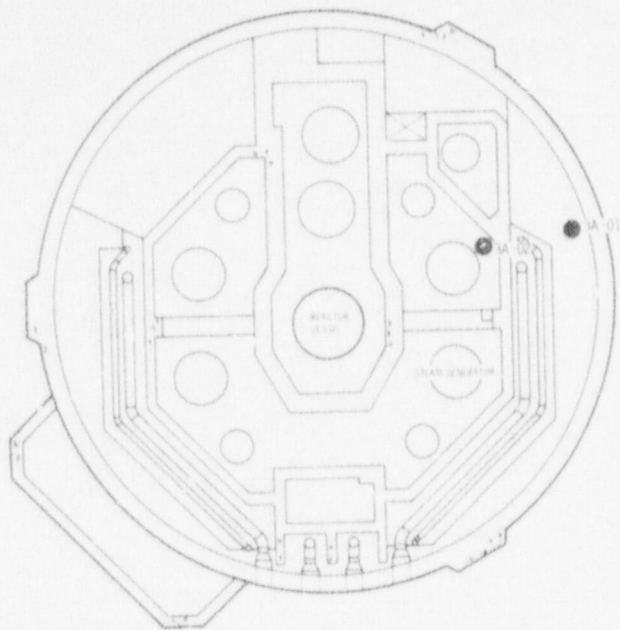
Source Locations in Containment Building At 77-Ft Elevation(10)
